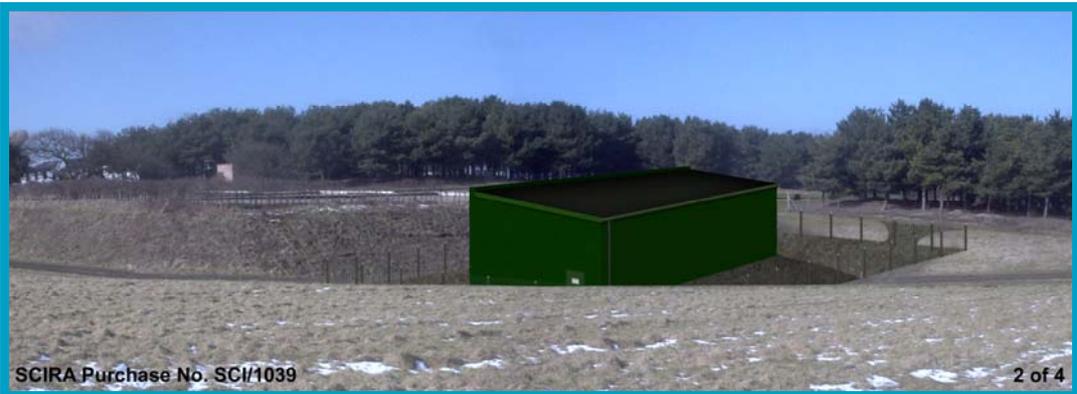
d Photomontage of proposed new Switch Room Building at “The Muckleburgh Collection” Weybourne, Norfolk (viewed from south).
